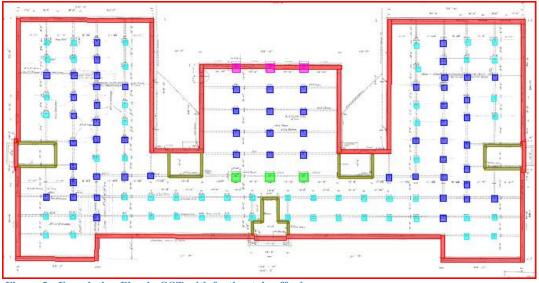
Foundation Plan in OST with footing takeoffs shown
